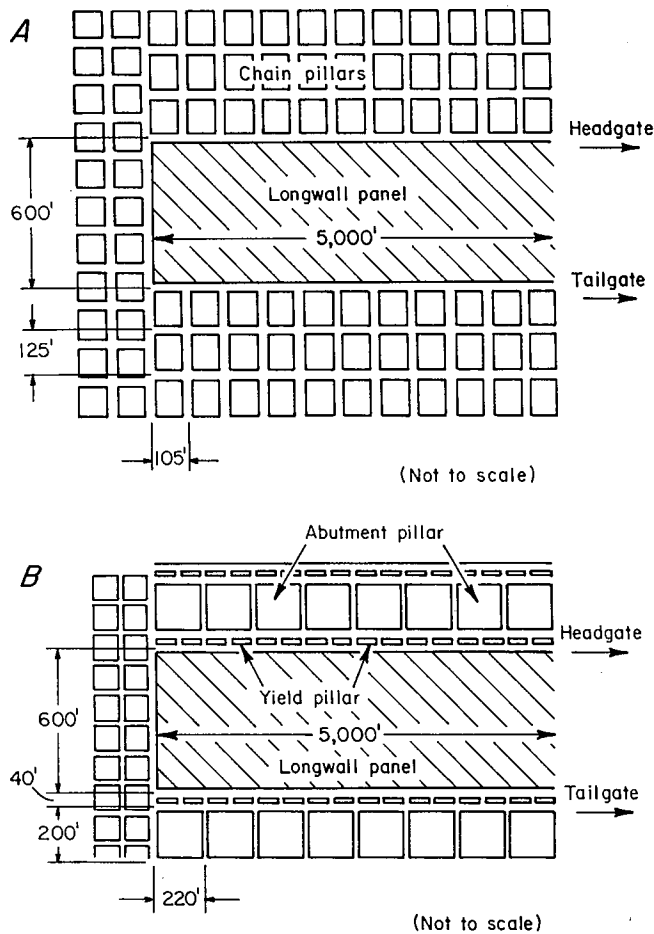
Evolution of longwall pillar designs at Jim Walter Resources (after Carr (18)). A, Original design with equal-sized pillars; B, improved yield-abutment-yield design.
